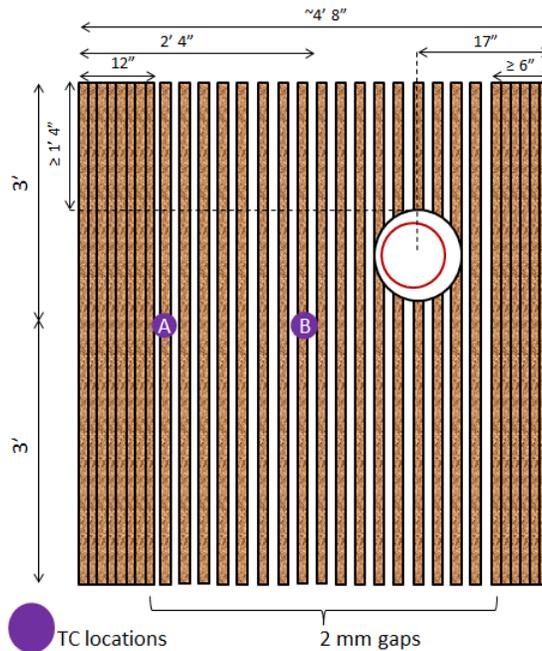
Layout of Test 2. 2x8 NLT with penetration
